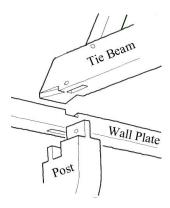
Tie beam lap dovetail assembly. Construction detail of the tie beam, post and wall plate from section K-L.
